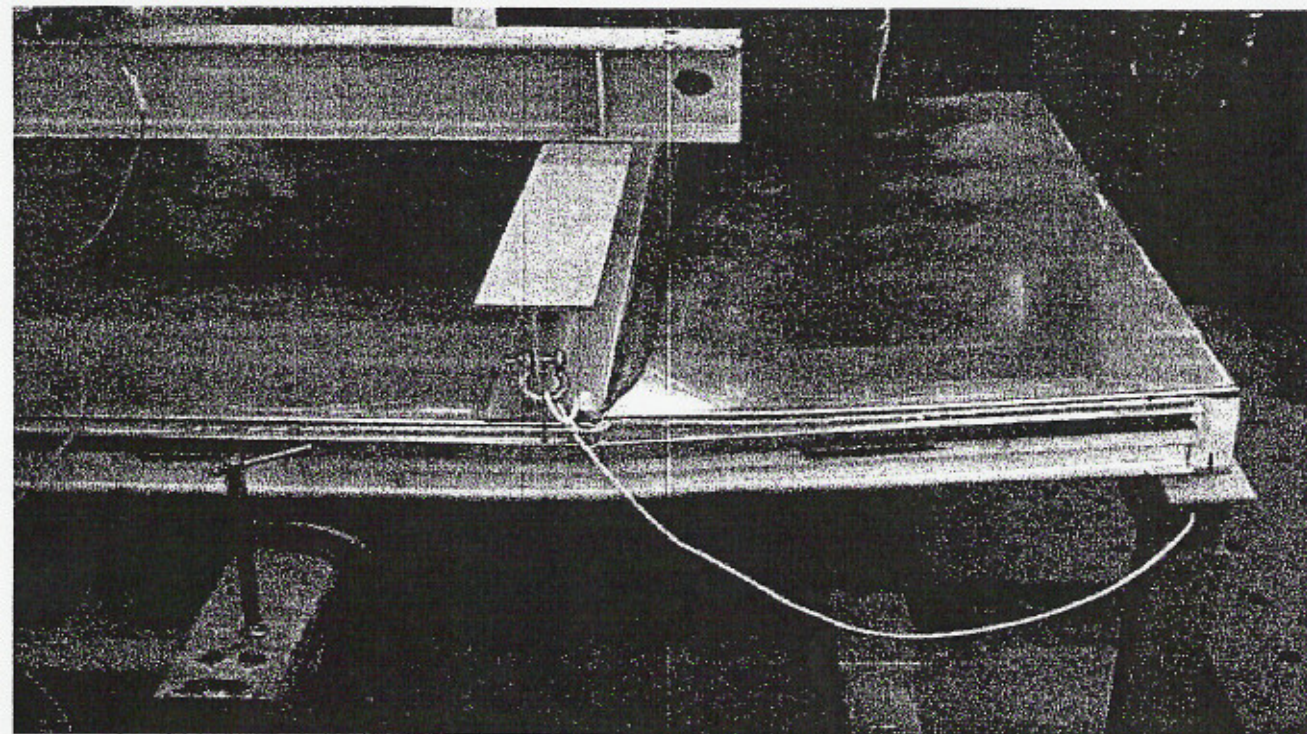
Failure of 8' Galv.-Galv. Panel Under Transverse Loading
